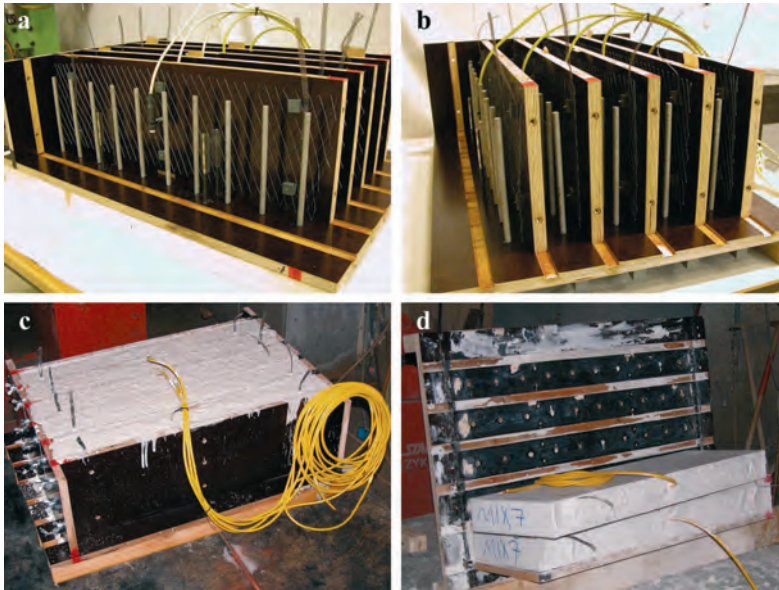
Production of test specimens: a, b: Side and end views of the five specimen mould (side and end wall removed). c: The mould is placed on a vibration table and the specimens cast. d: The specimens are demoulded after one day.
